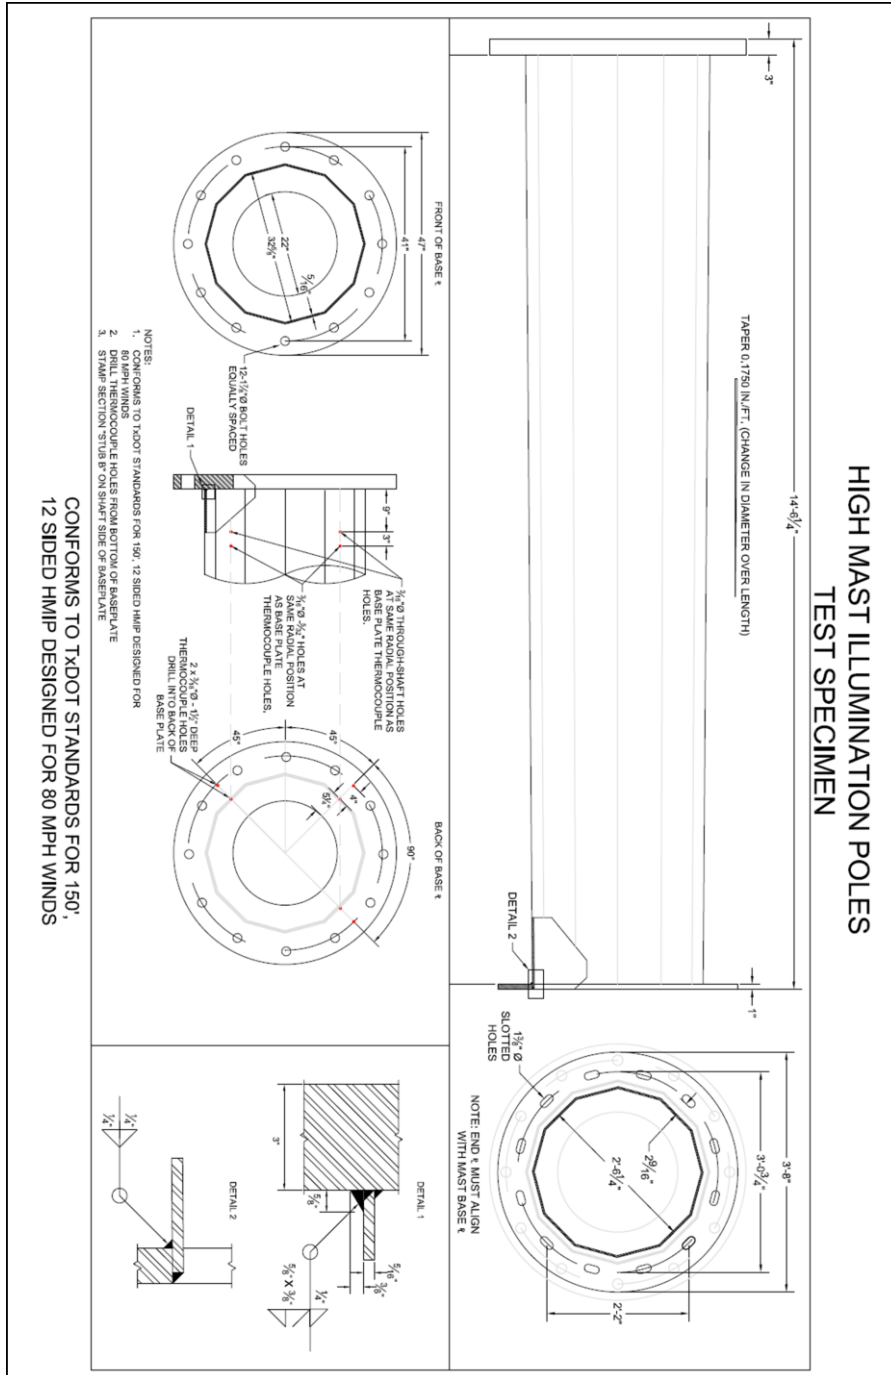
Design drawing for specimen 33-3-12-TX-SG-C
